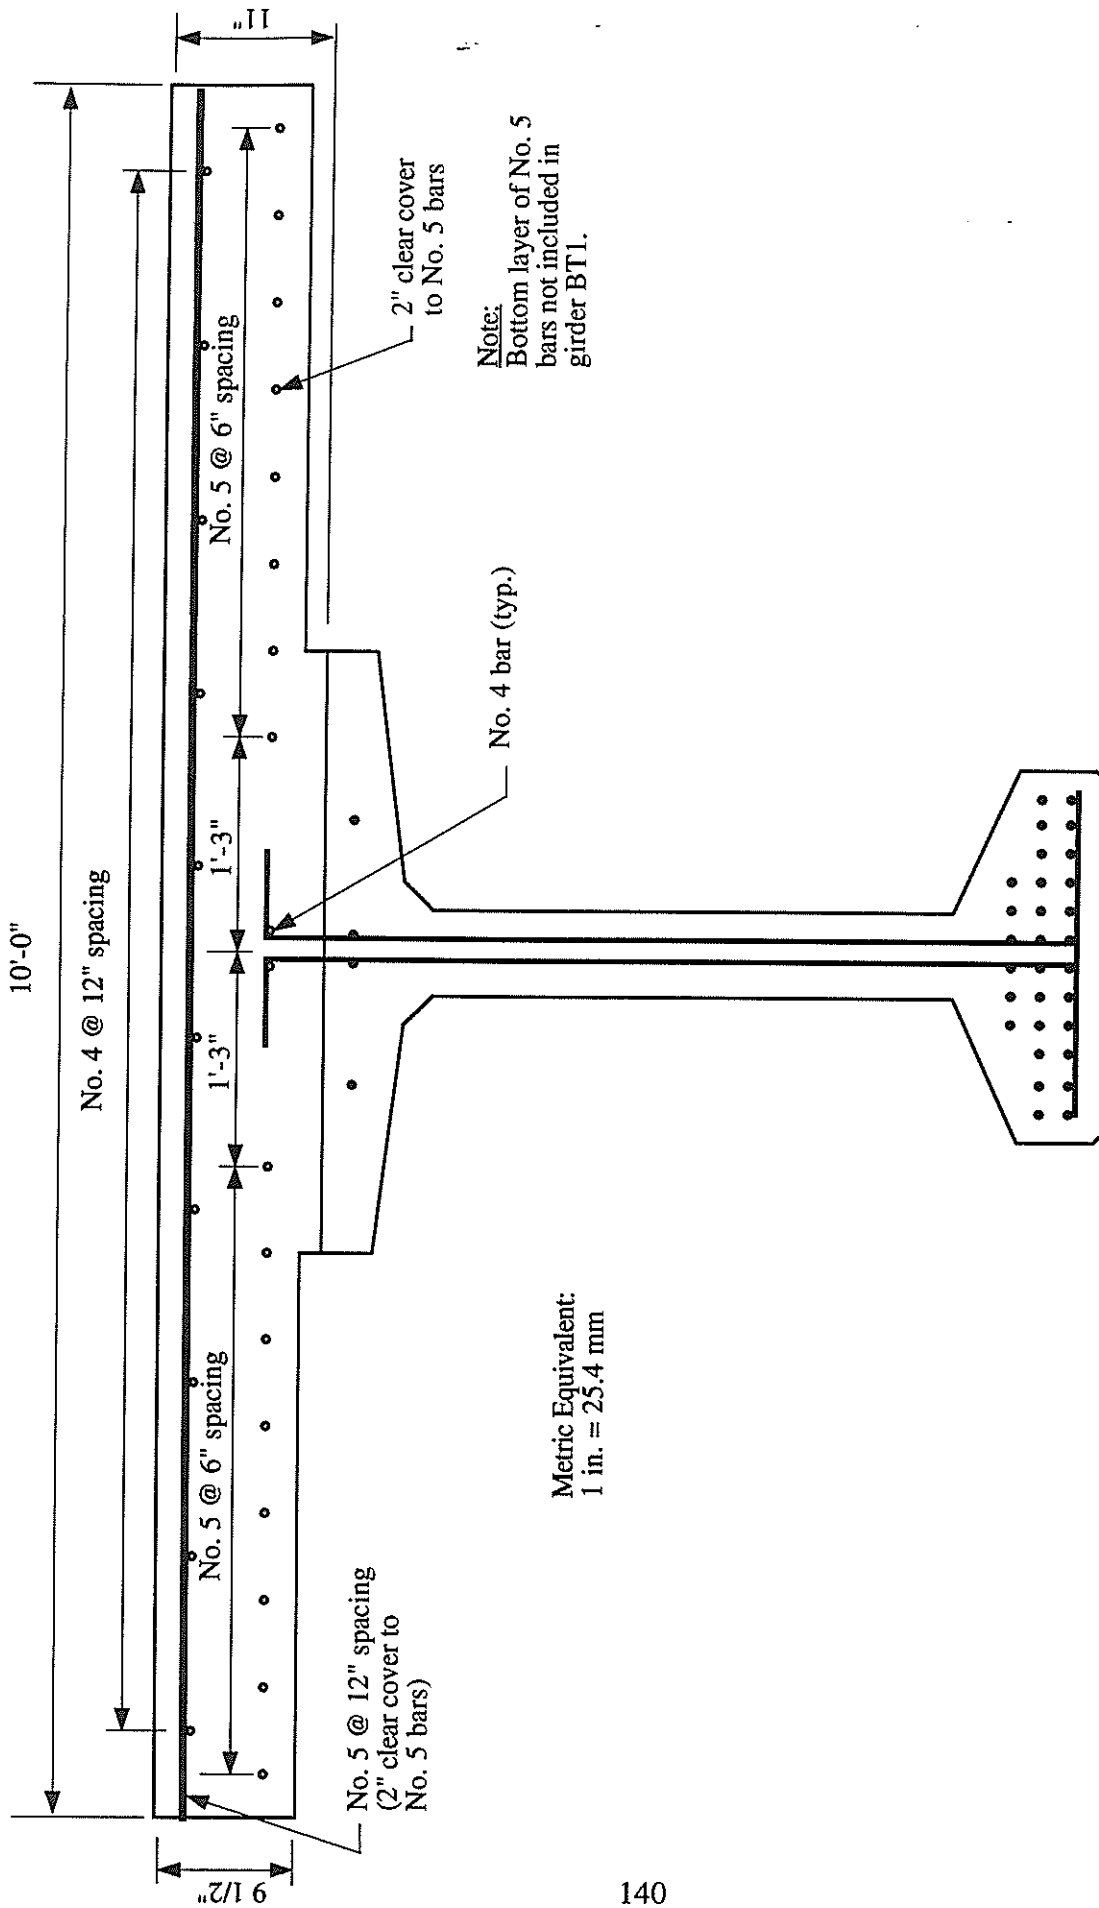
Deck slab dimensions and reinforcement details for girder specimens
